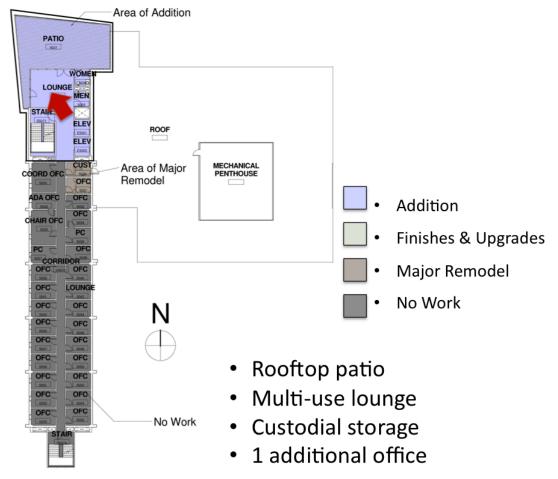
Level 5 Floor Plan, Features, & Rendering Location
